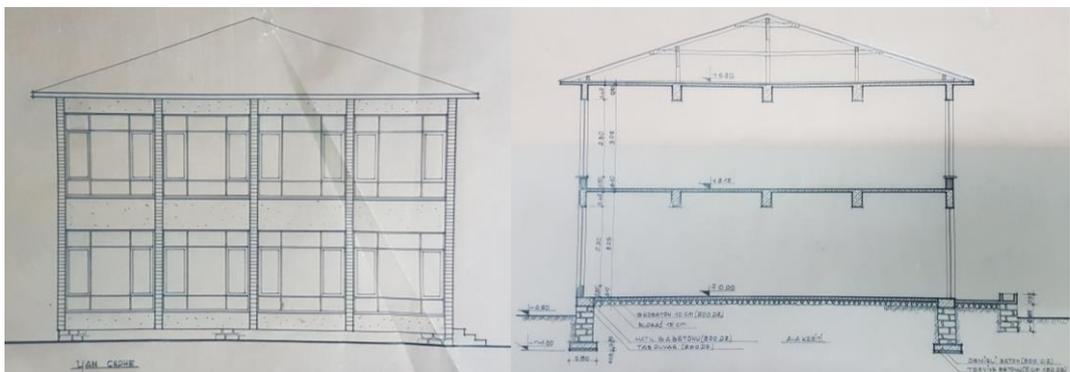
The elevation and section drawing of the officers' club (Source: TTK Archive, 2020)
